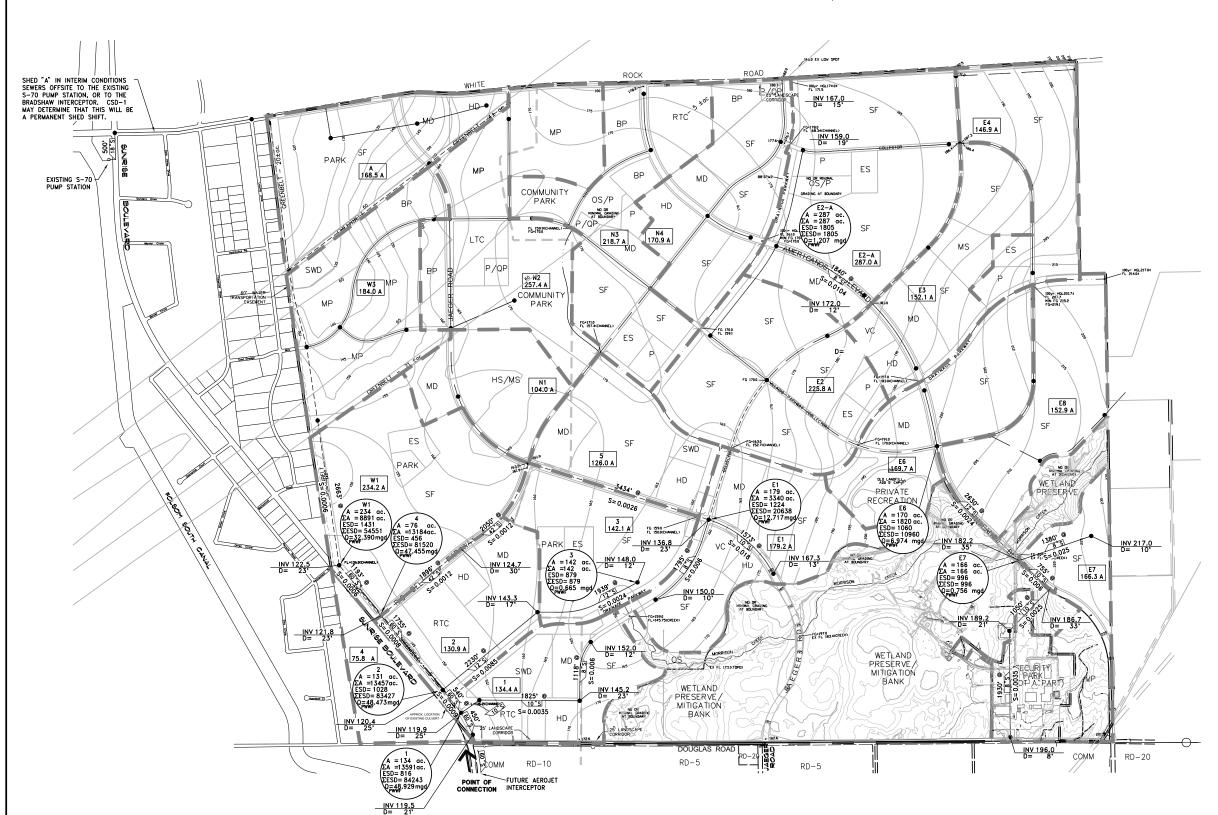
EXHIBIT D ON-SITE SEWER FACILITIES PLAN
